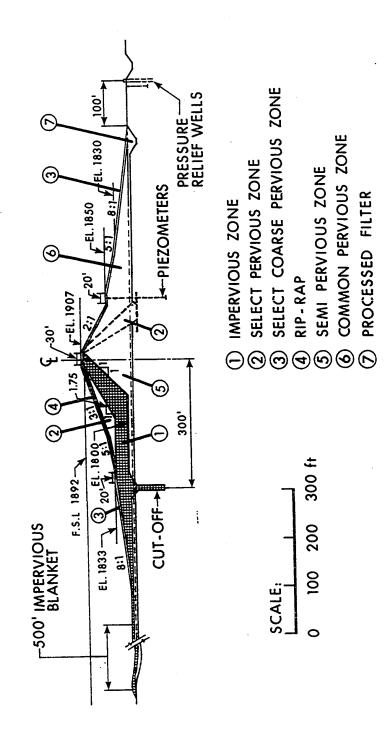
A TYPICAL CROSS SECTION OF DUNCAN DAM [AFTER GORDON AND DUGUID, 1970]
